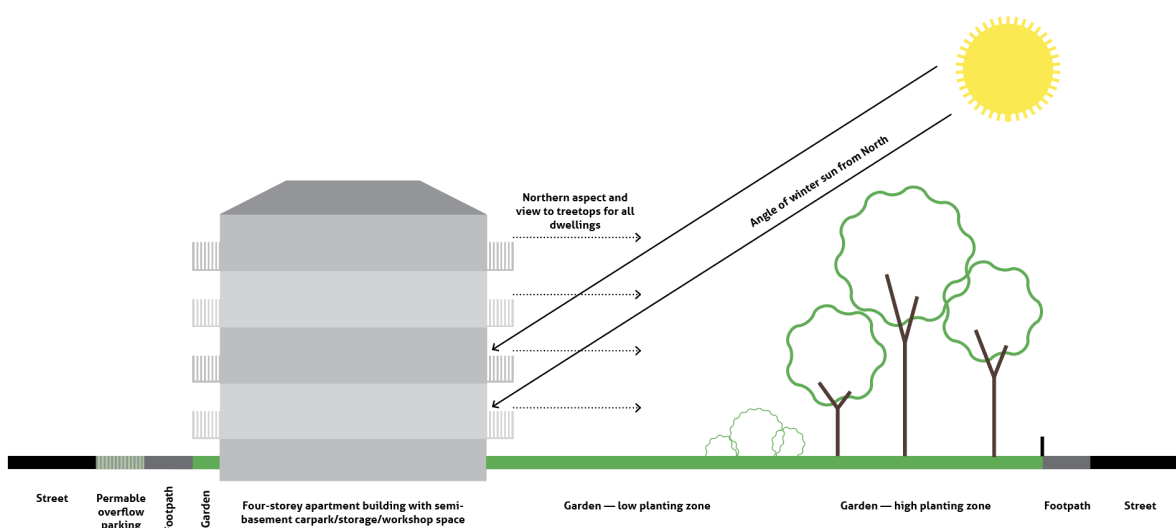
Section of the same land area developed as a four-storey apartment building. Note how each apartment has access to sunlight and treetop views. 25-30% of the area is dedicated to tree canopy, and areas of green space and permeable surfaces are significantly increased. Image courtesy of author.
